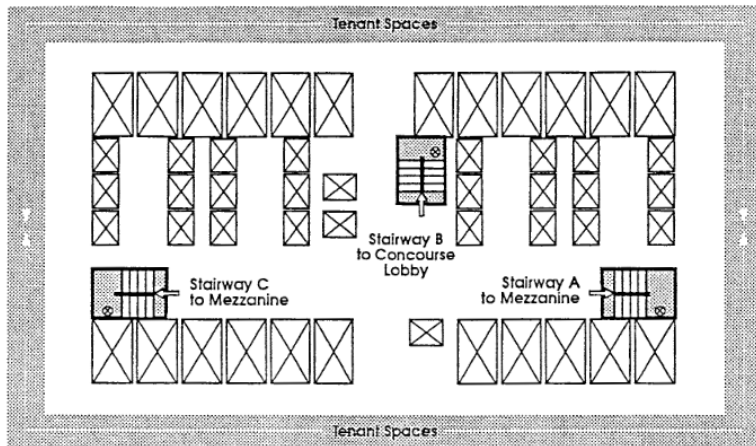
General floorplan with the stairway's location (Manning, 1993)
